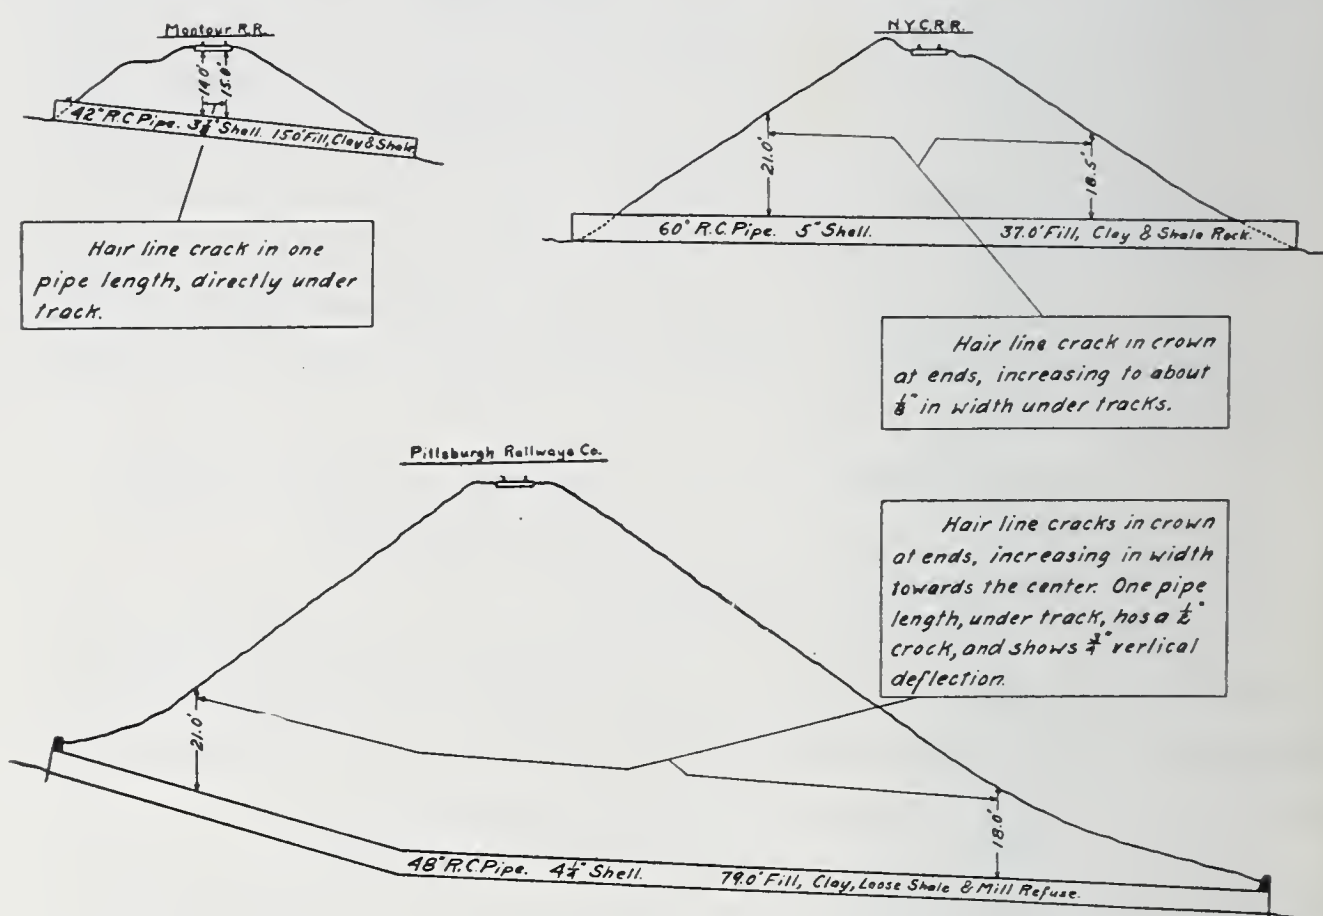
Reinforced Concrete Pipe Culverts, Showing Tendency to Crack Under Fills.
